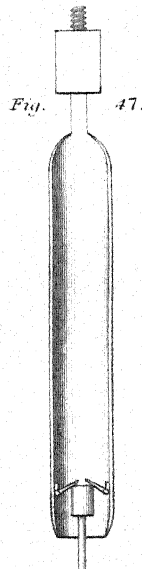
Tool to draw up a broken Augur the head pushing back the catches which then hold it fast.
